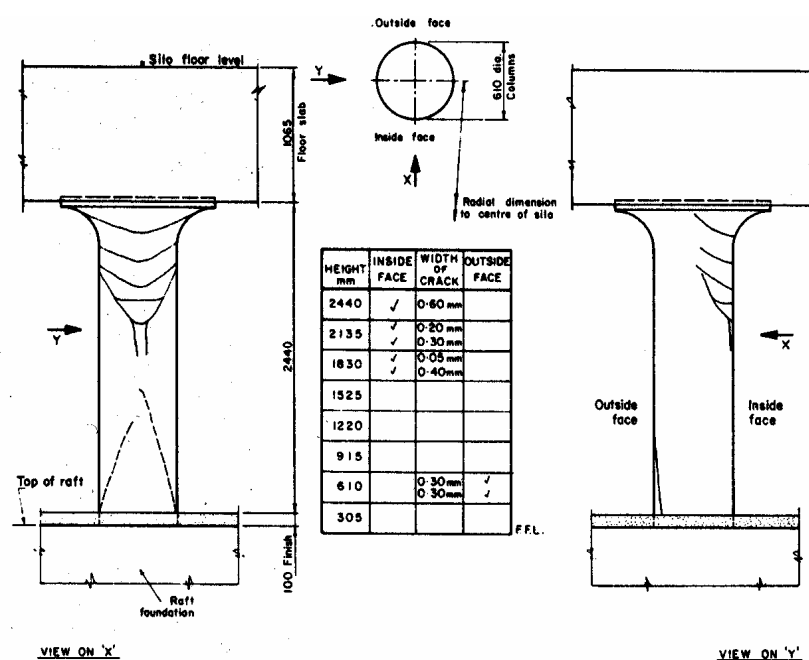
Damage on a floor column of a silo (Burland and Davidson 1976)
